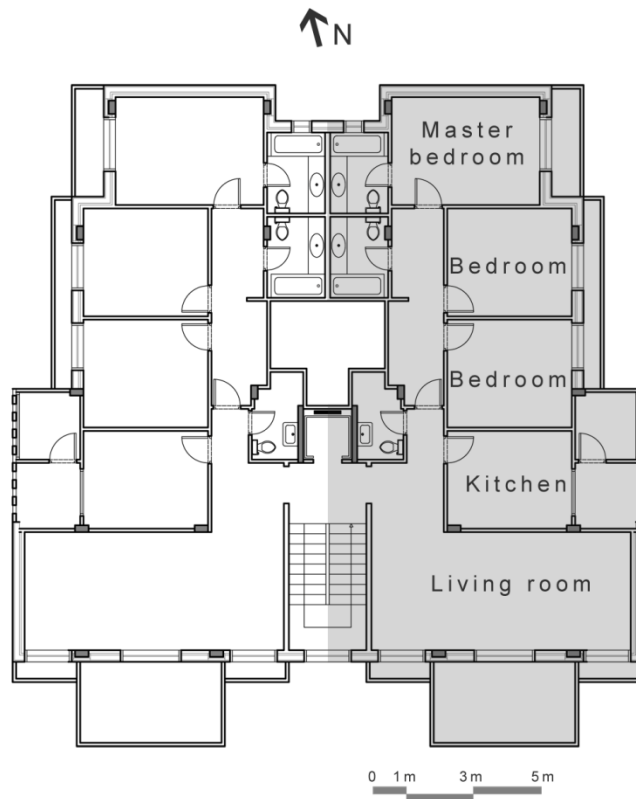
Plan view of a typical floor of the case study apartment building in Sehaileh, Lebanon. Note: The shaded area represents a gross floor area of 154 m².
